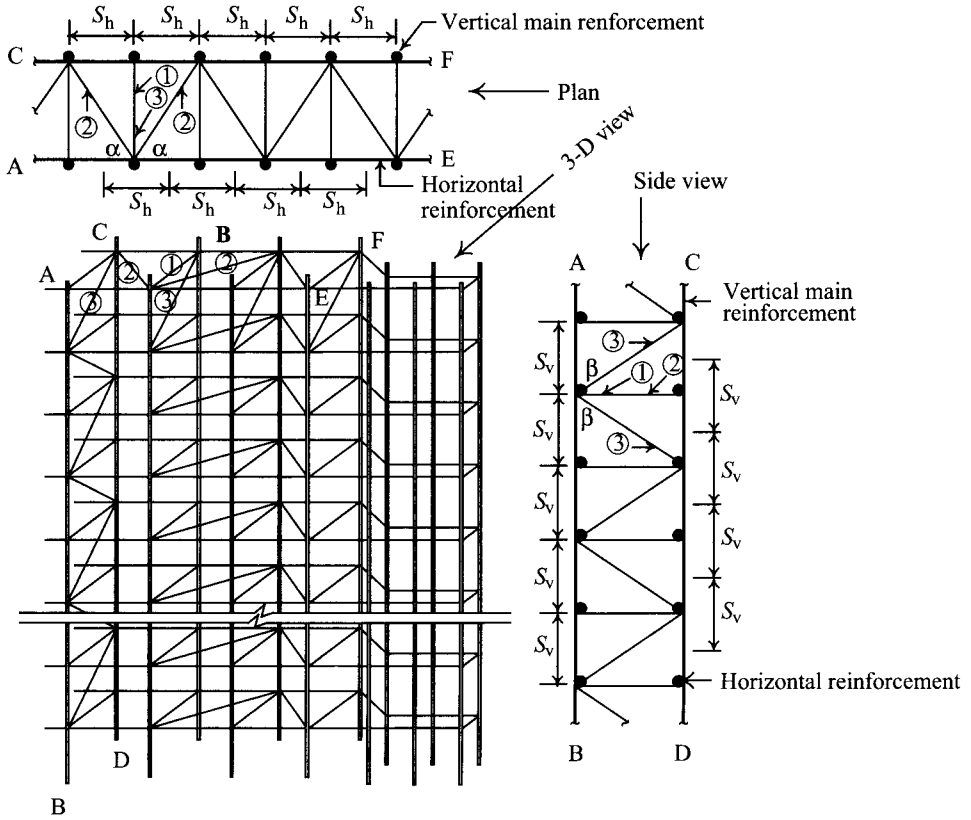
Plan, 3-D view, side view of a steel cage of diaphragm wall (1, 2, and 3 represent shear reinforcements).
